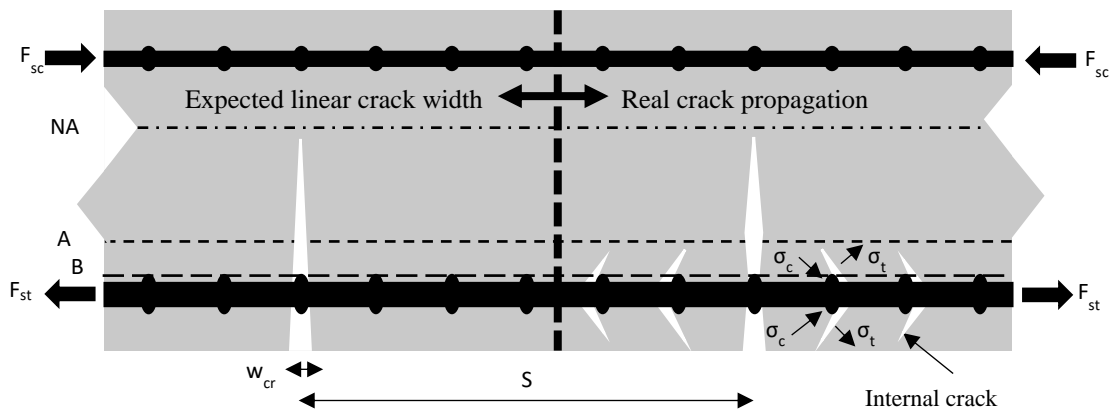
Crack closing at reinforcement level due to internal cracking.
